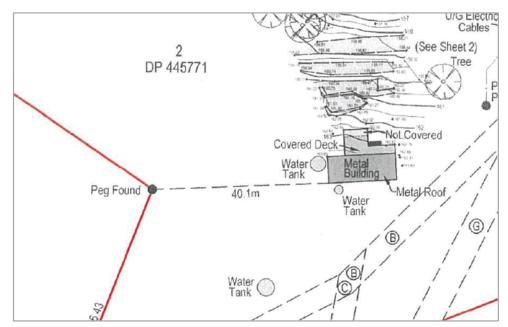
Part survey plan showing 40.1m distance from building to closest boundary point.
